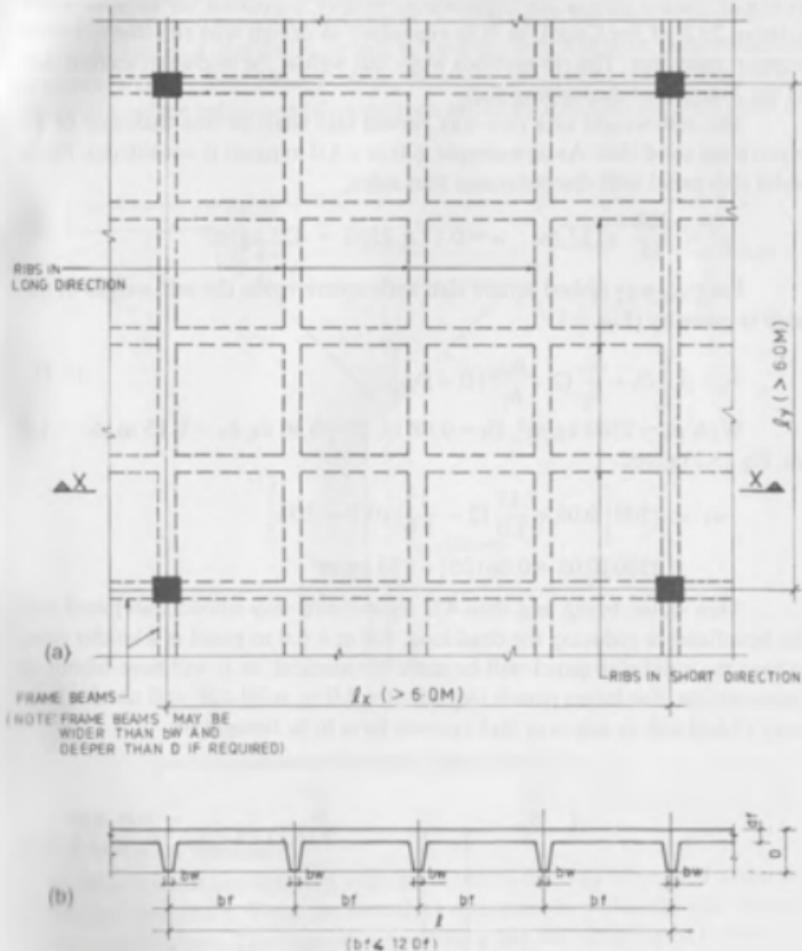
Two-way ribbed slab panel in plan. (a) Plan; (b) Section X-X.
